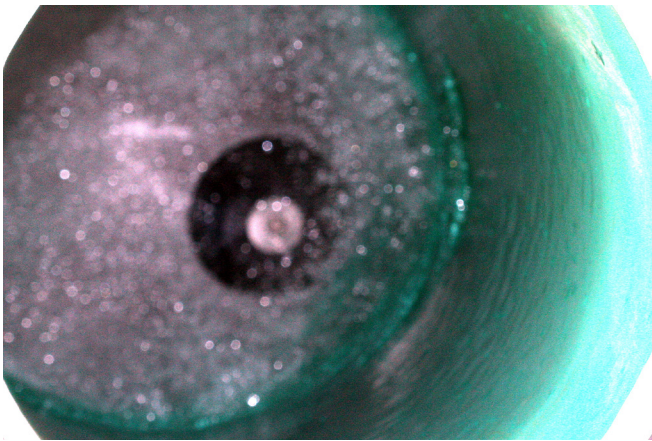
Testing of self-rotating and thrusting nozzle used to clear sidewall sludge and debris.
